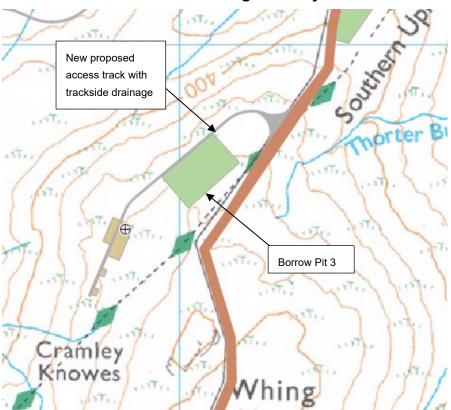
Borrow Pit 3. Indicative Mitigation Layout
